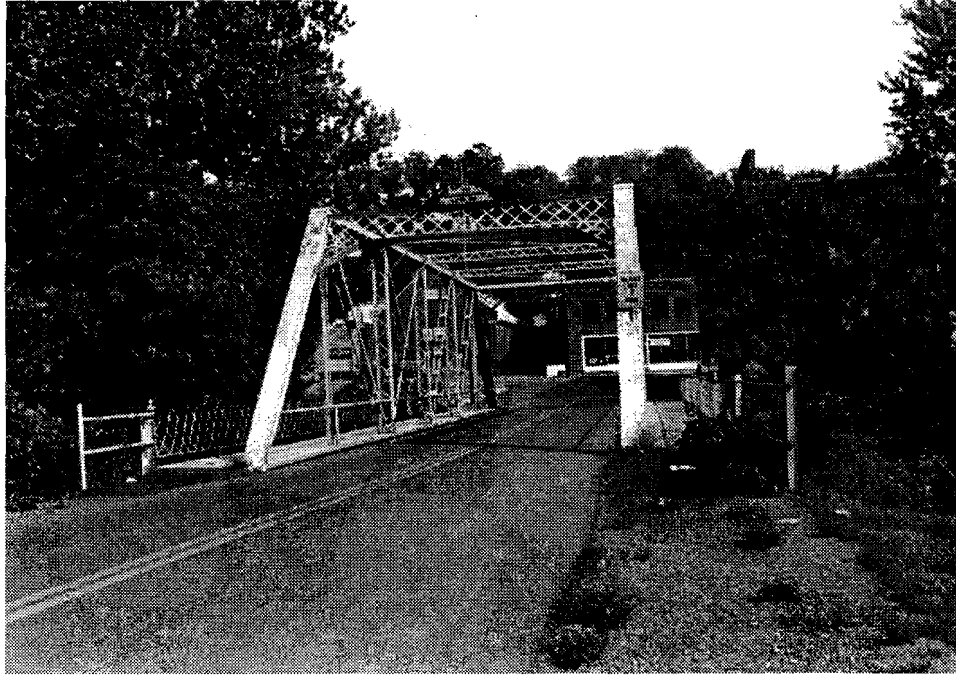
Two Lane Pratt Through Truss Built in 1885 (Town of Marion Structure No. 8003)
